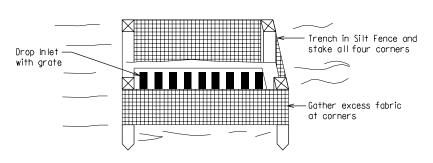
A.12 Filter Fabric Drop Inlet Protection
